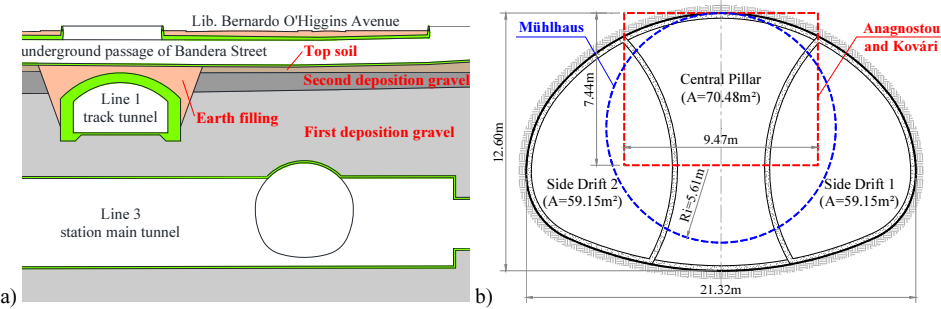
The main tunnel for the Universidad de Chile Station: a) longitudinal section, with soil stratigraphy and surrounding structures, b) cross-section geometry [32].
